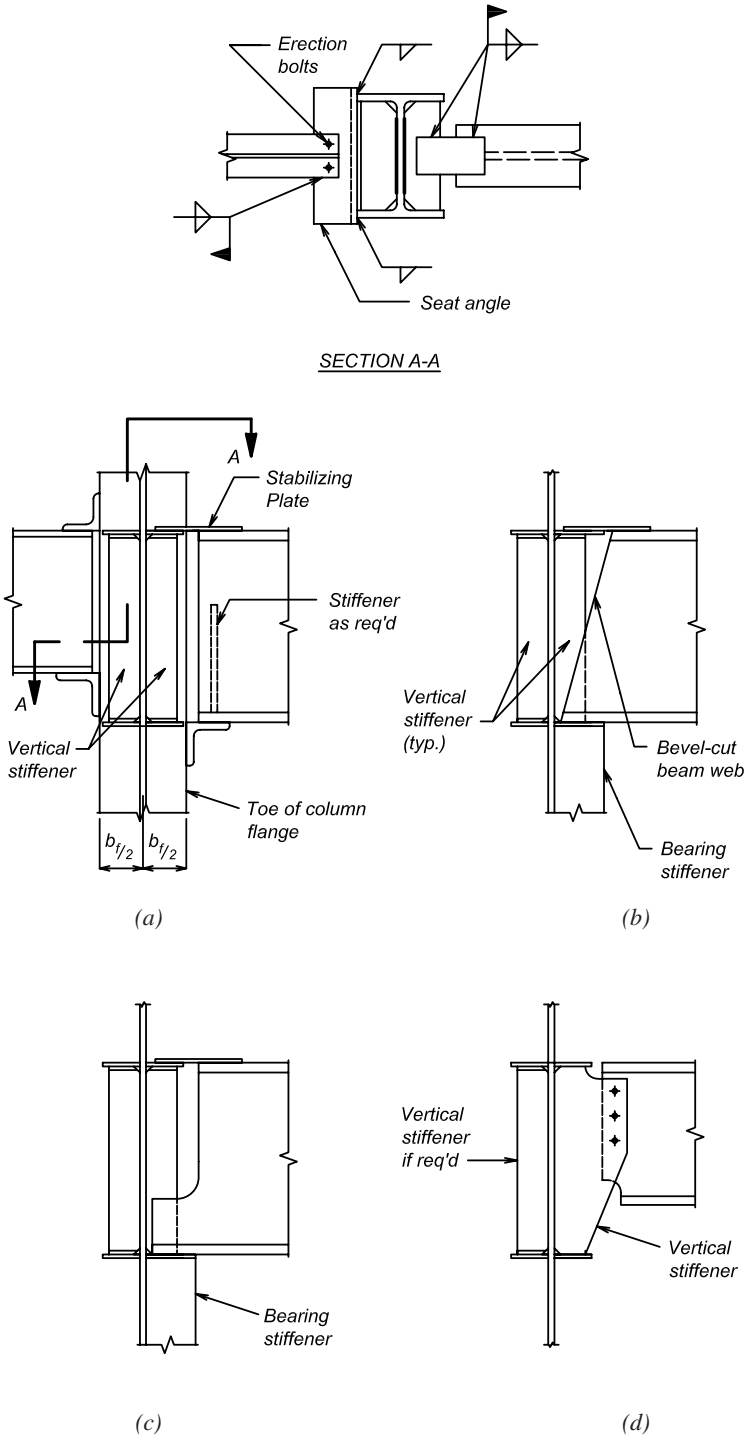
Simple shear connections at stiffened column-web locations.
